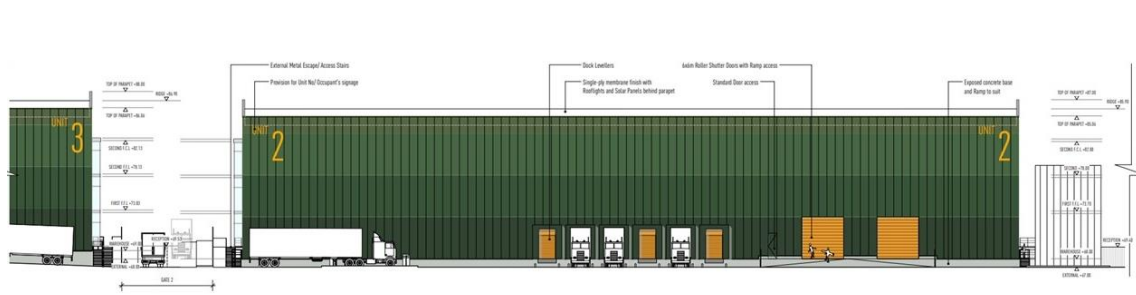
Proposed Unit 2 South Elevation (indicative only)
